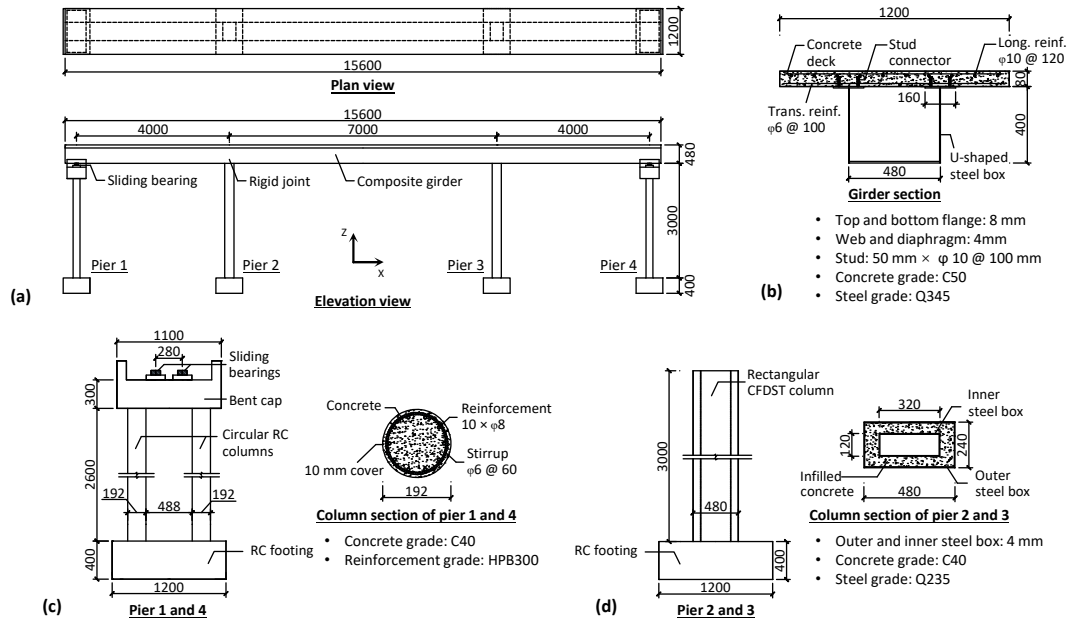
Geometry and material details of the bridge model (unit: mm): (a) general view; (b) cross section of the bridge girder; (c) side piers; (d) middle piers
